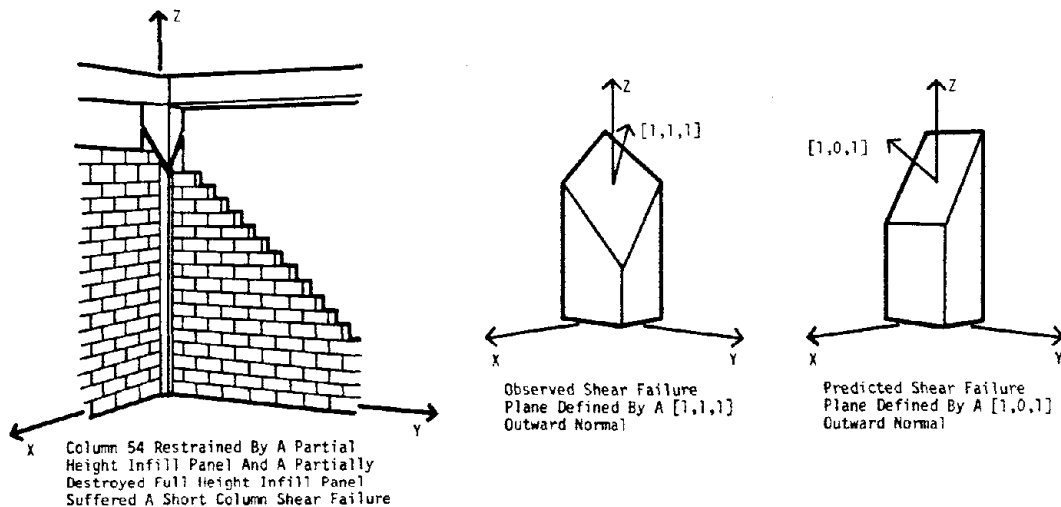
DETAIL OF THE SHEAR FAILURE OF THE CAPTIVE COLUMN 54
